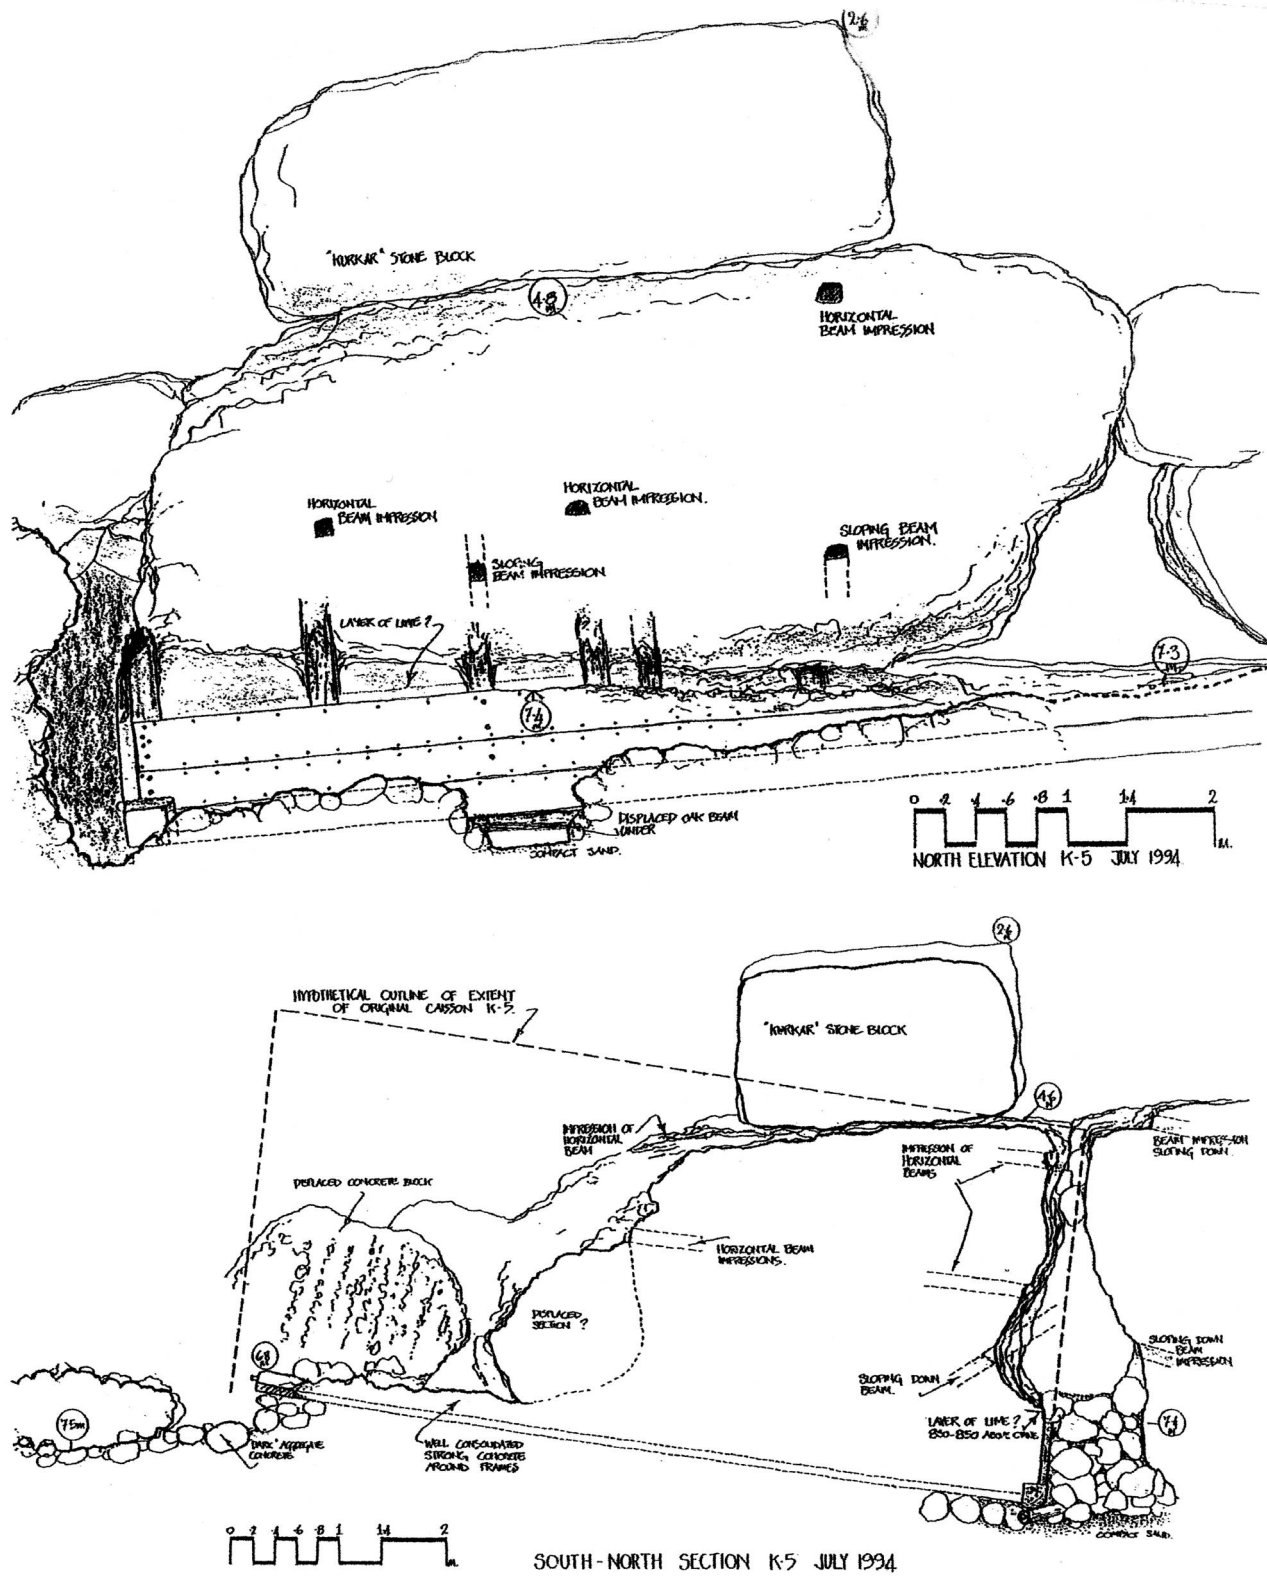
Sketch of N elevation and S-N section of block K5 (Drawings: C. Brandon)
